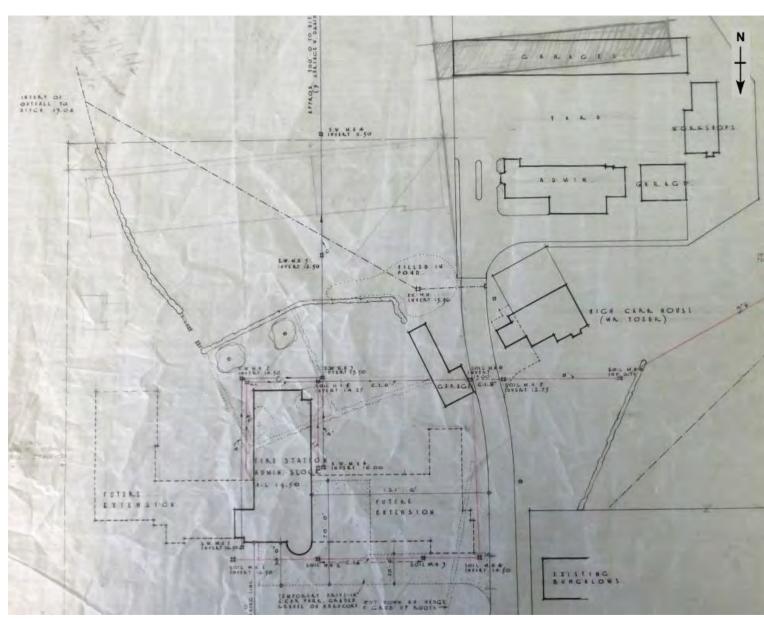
Proposed Ambulance Depot and Fire Brigade Headquarters, block plan, c. 1953
